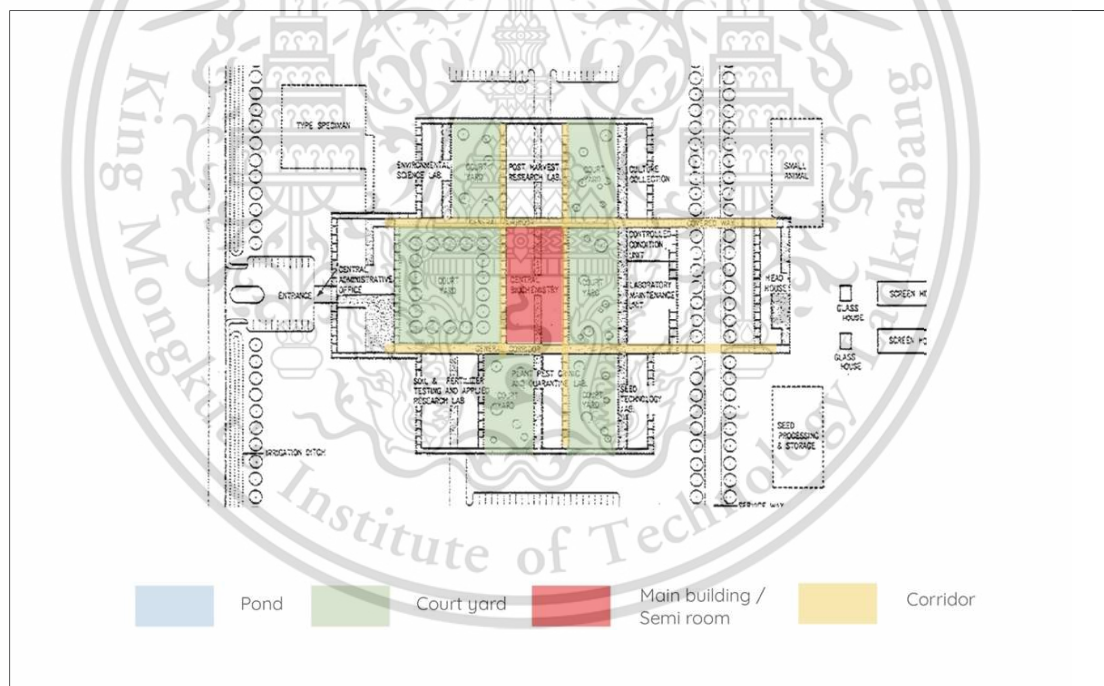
2: Central Laboratory and Greenhouse Complex.
